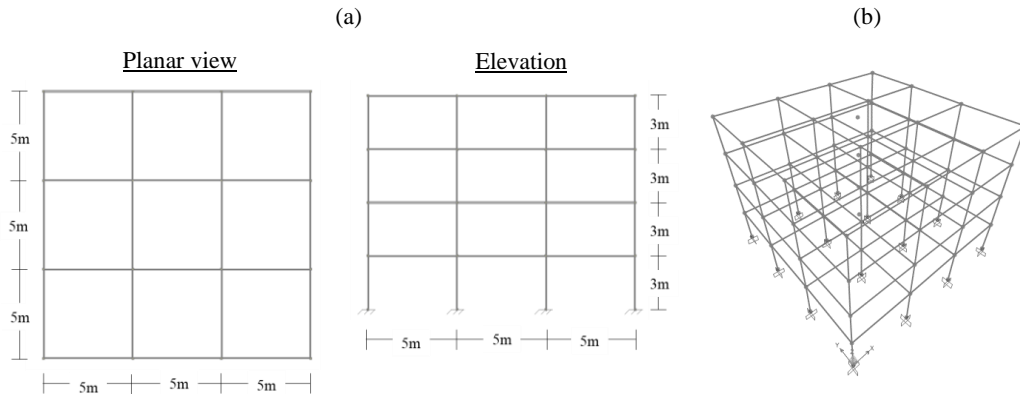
(a) Plan and elevation of the building, (b) 3D model of the building at the design stage
